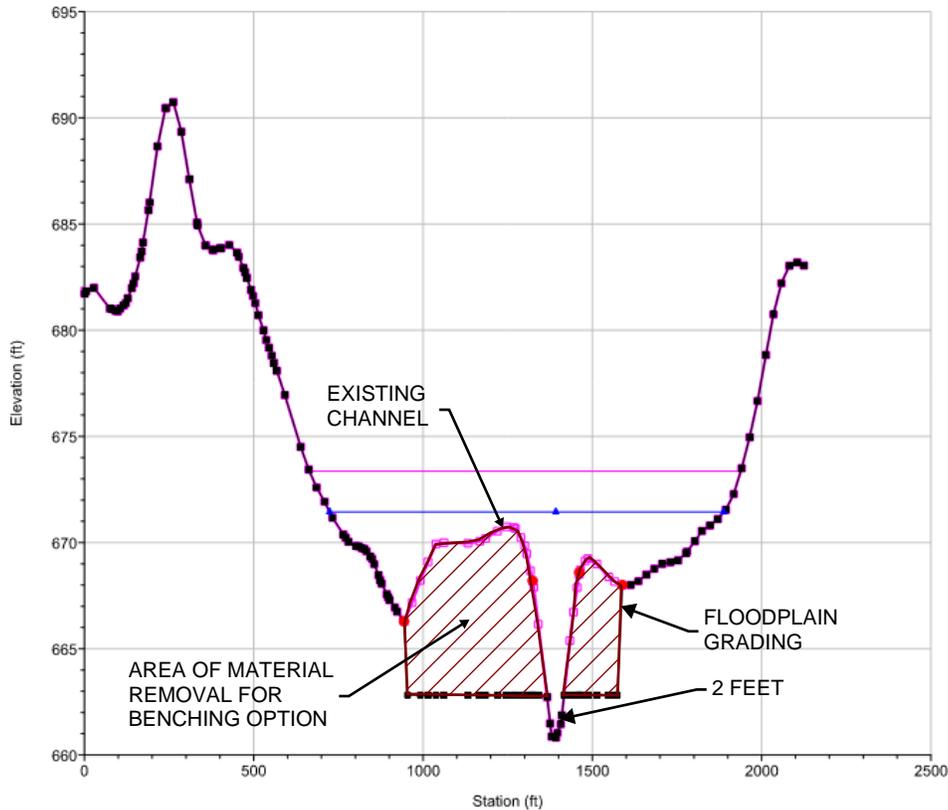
Typical Channel Grading Section from Fox Lane to East Renfro Street.
